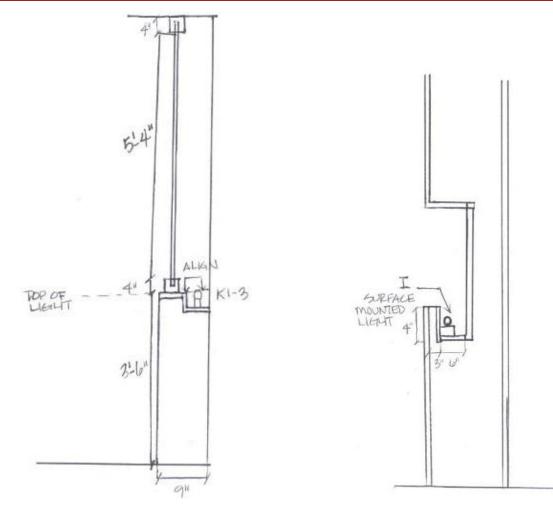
Entry Signage/ Receptionist Back Wall Detail in Lobby | NTS
